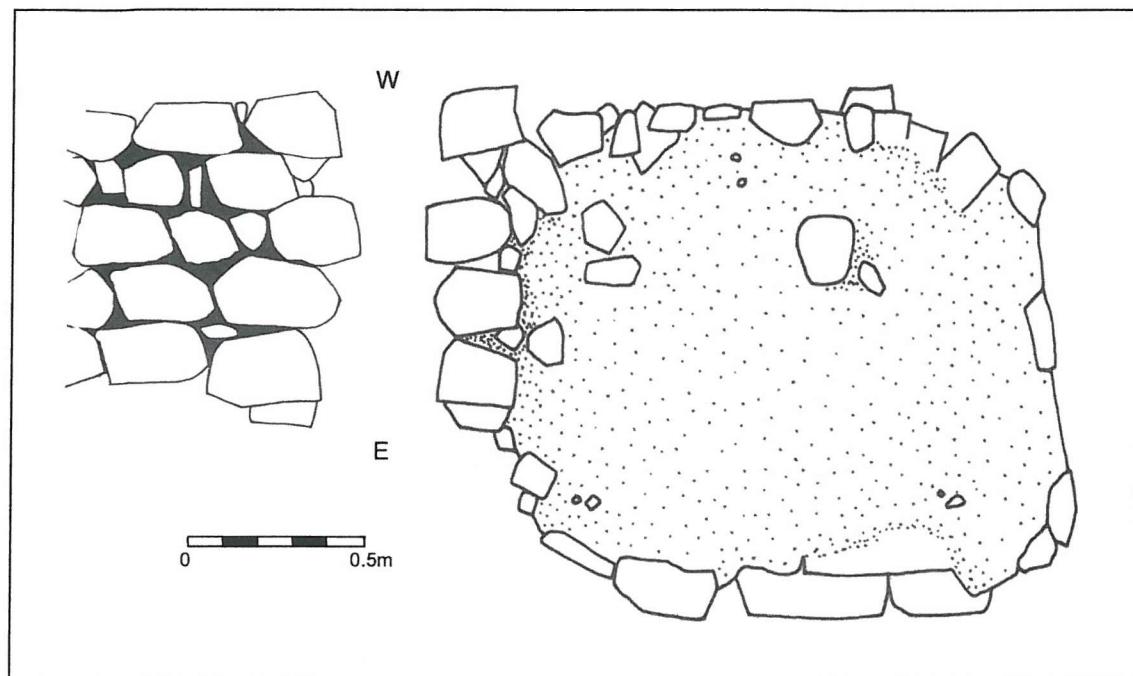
Detail of masonry block, in elevation (left) and in plan (right)
